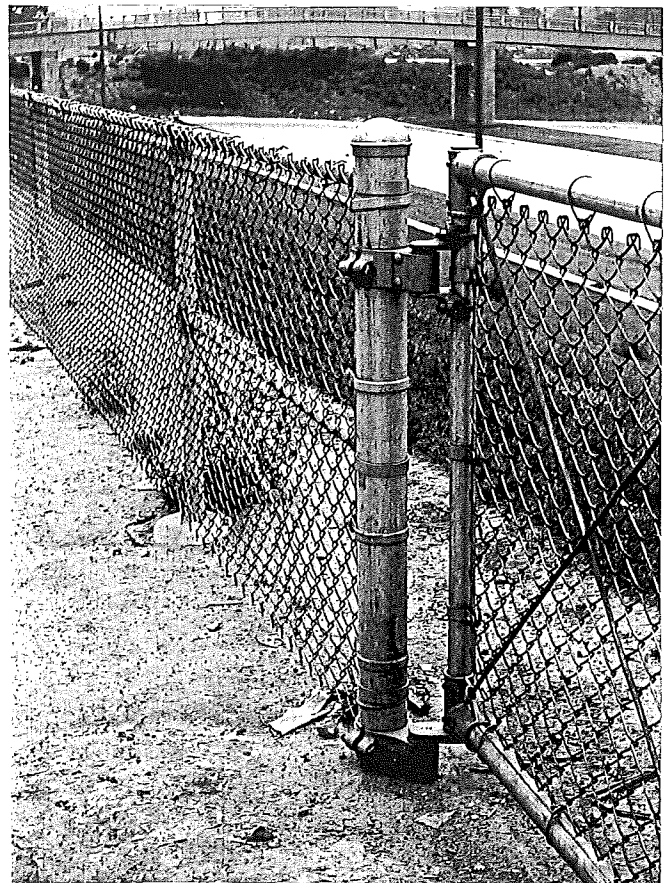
Expedient used to install gate which was too short for the opening between posts; note corner fittings and braces.
